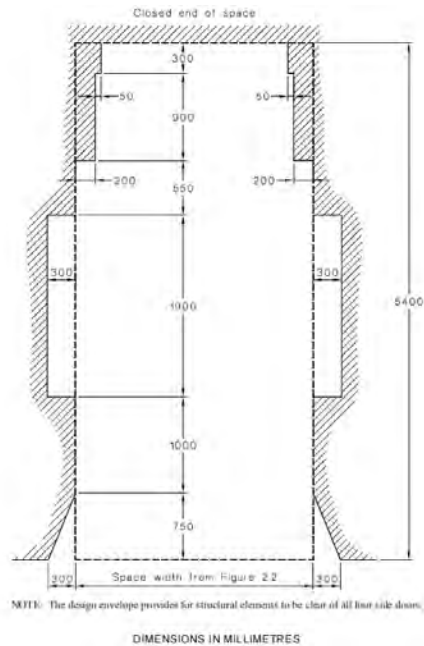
DESIGN ENVELOPE AROUND PARKED VEHICLE TO BE KEPT CLEAR OF COLUMNS, WALLS AND OBSTRUCTIONS
